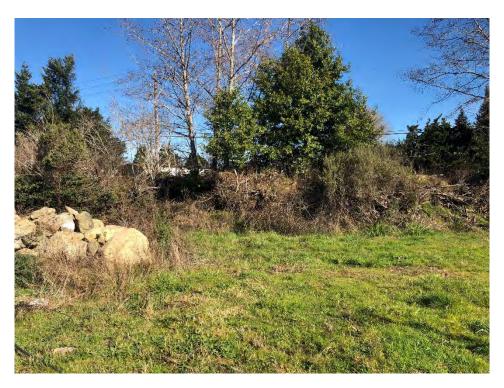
Facing northeast from Sundberg property towards the new Sundberg connection alignment and Glendale Drive, detail 4, sheet G-101.
